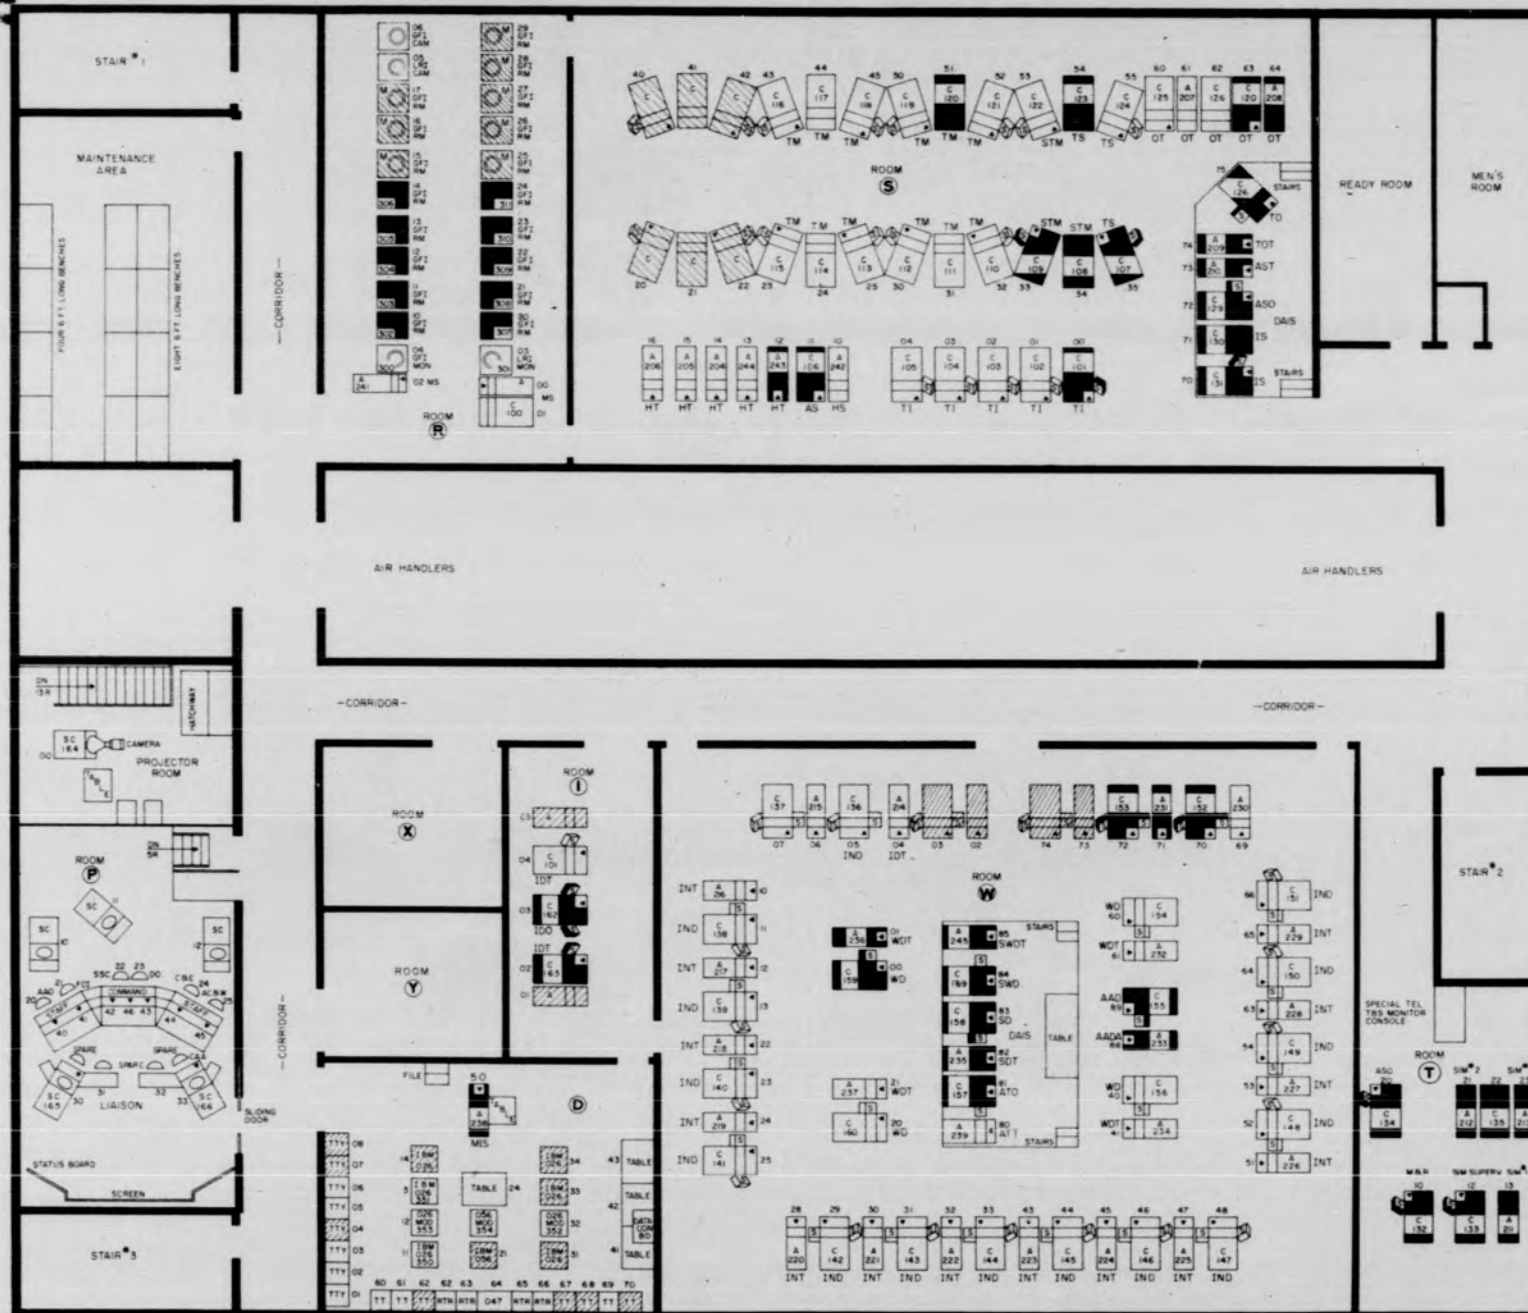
SECOND FLOOR LAYOUT, BUILDING F
